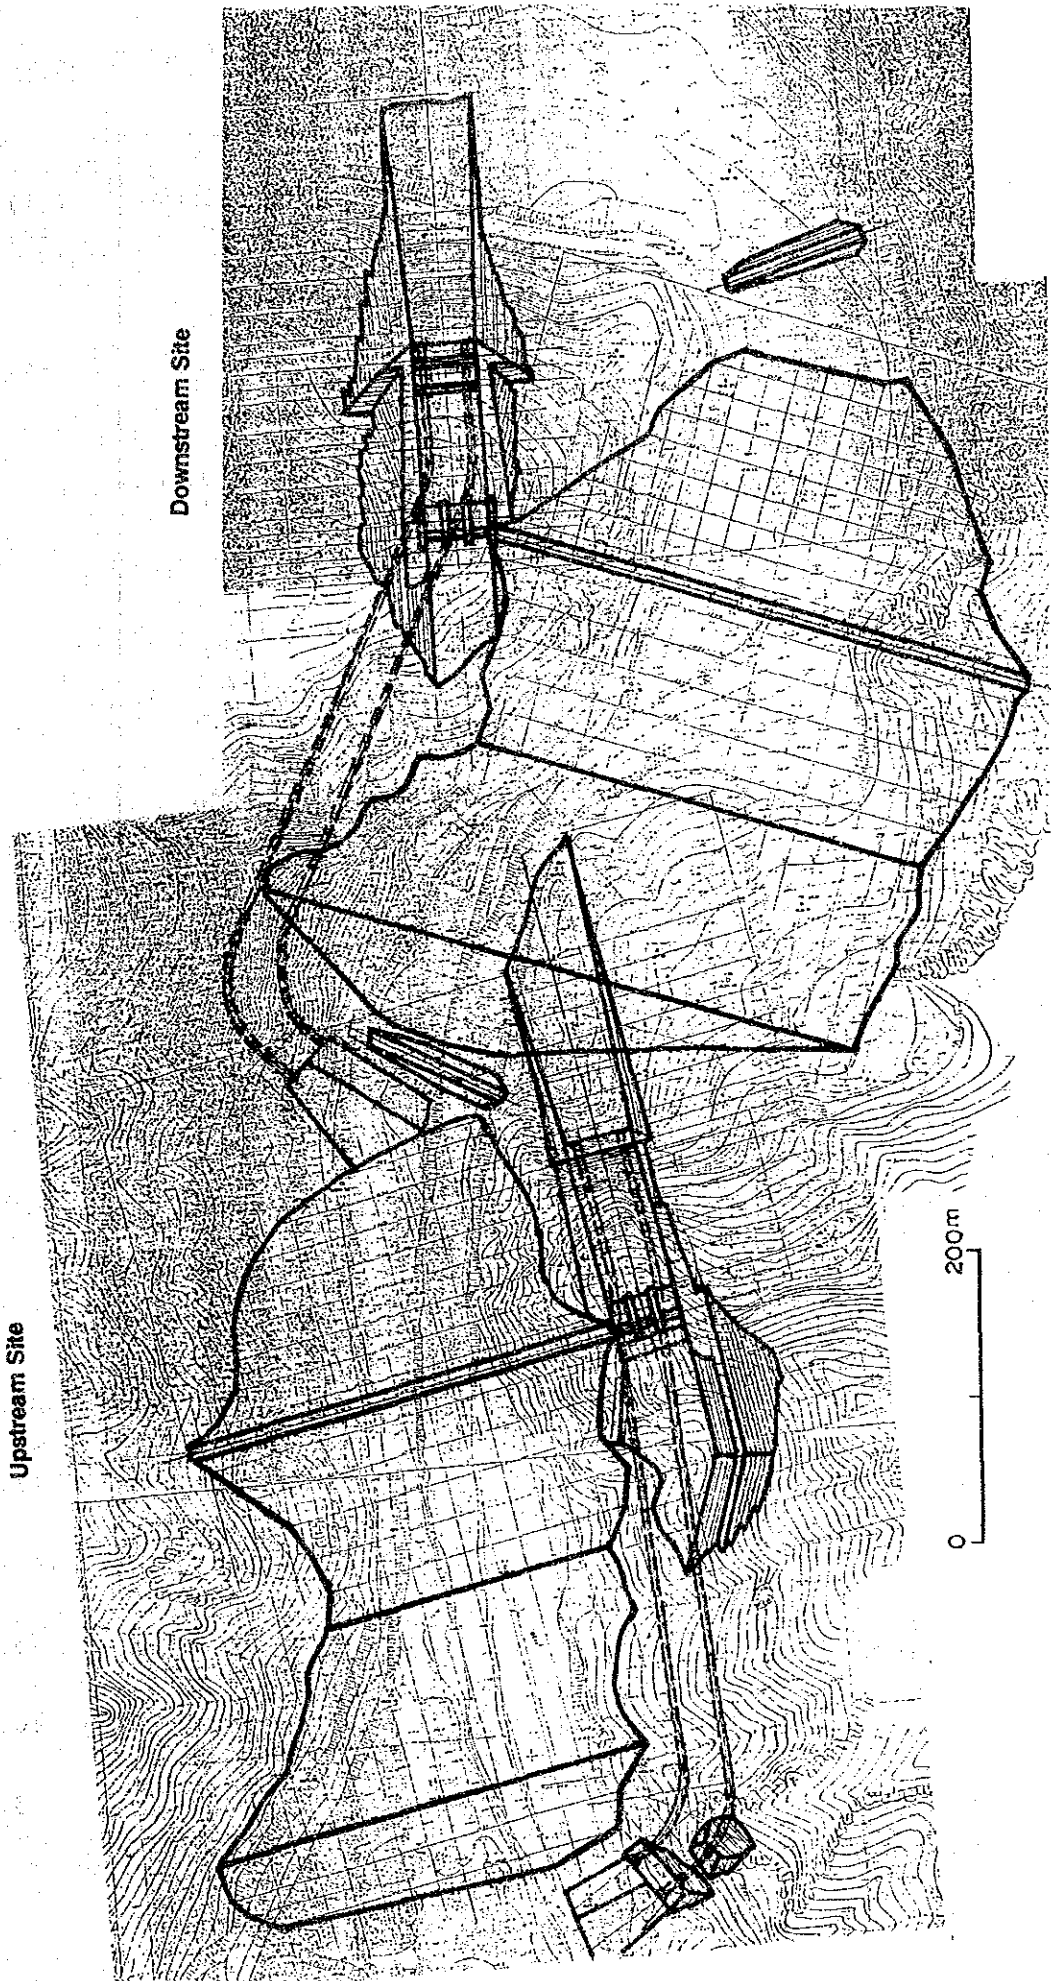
Preliminary Layout of Olur Dam Sites
